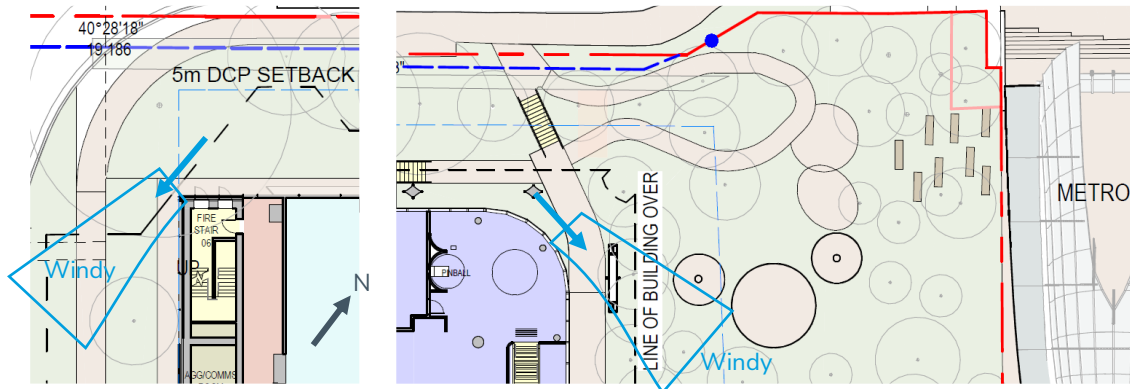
Ground floor plan of the west (L) and north (R) corners for winds from the north-west
